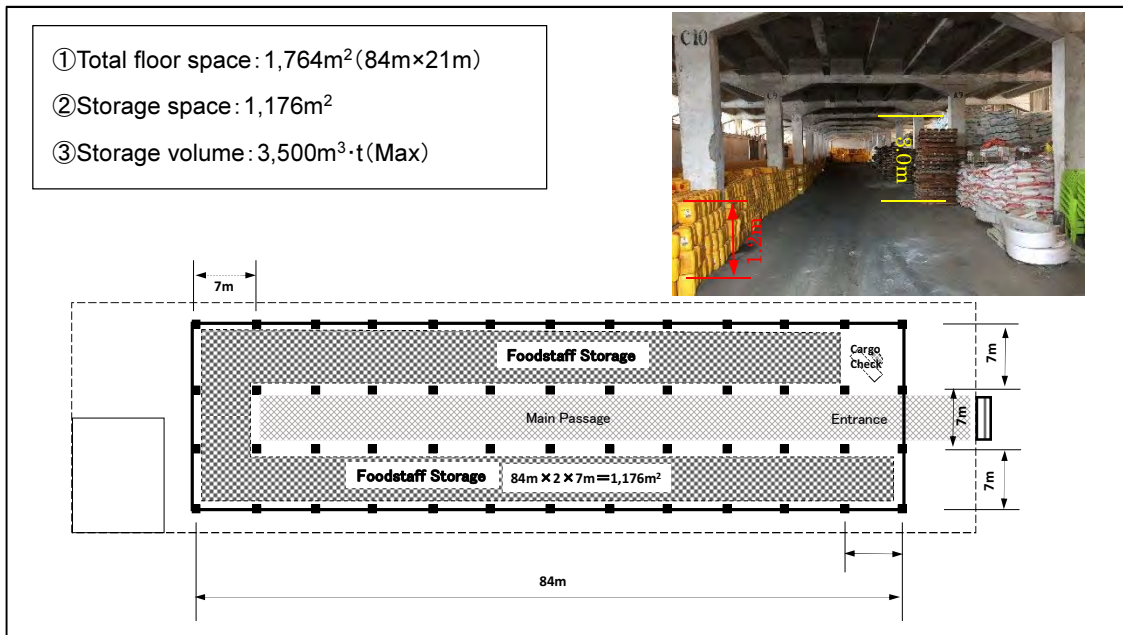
Foodstuff Storing Space in Existing General Cargo Warehouse
